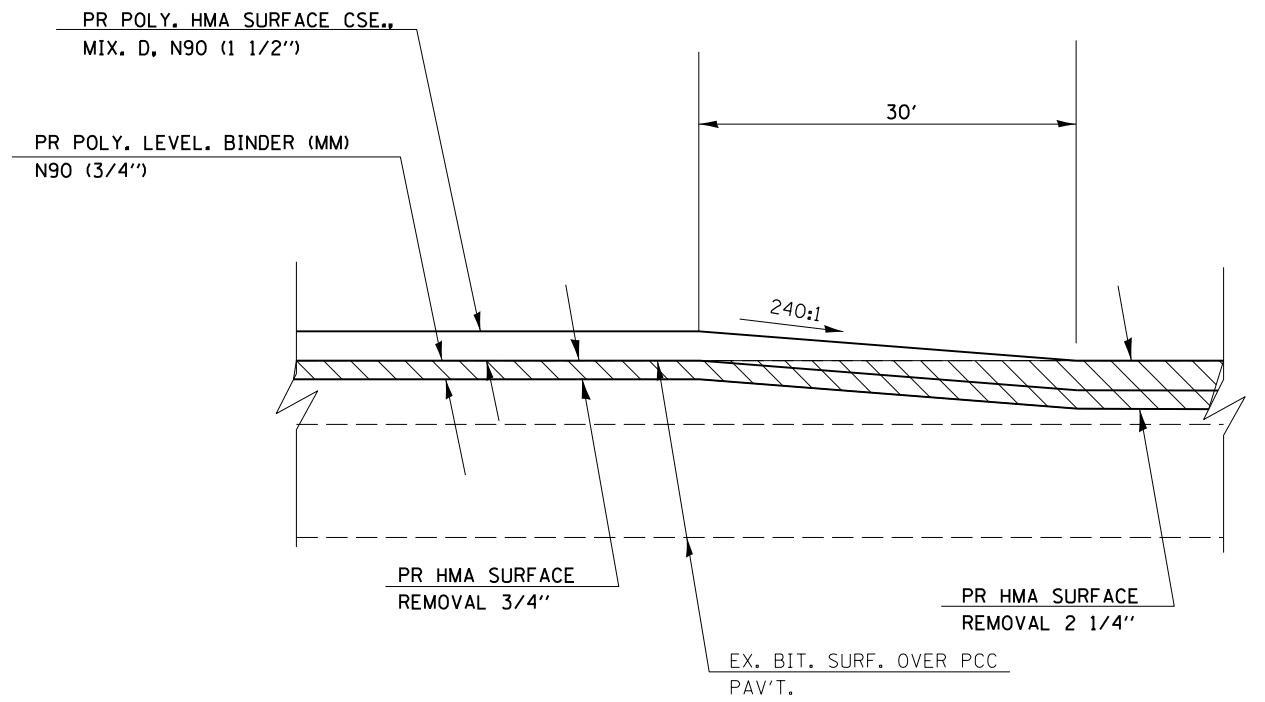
DETAIL FOR HMA SURFACE REMOVAL - BUTT JOINT
